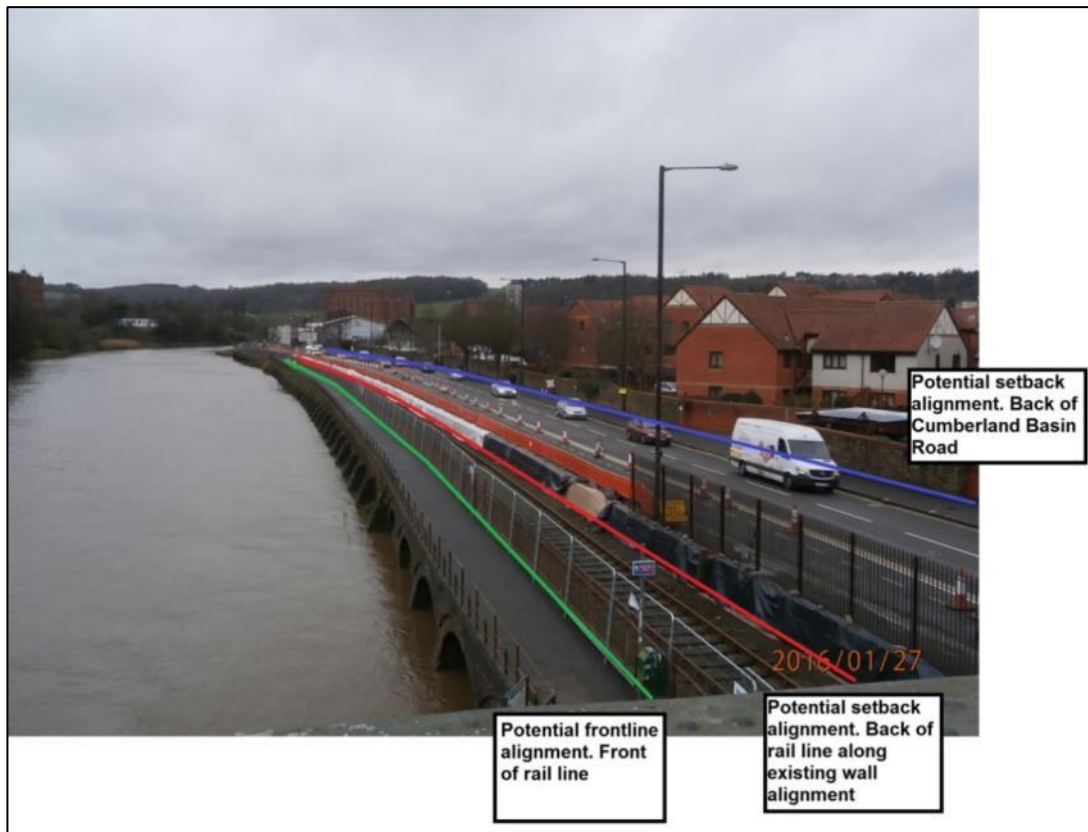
Potential defence alignments at Cumberland Road. Photo looking west along the New Cut)
